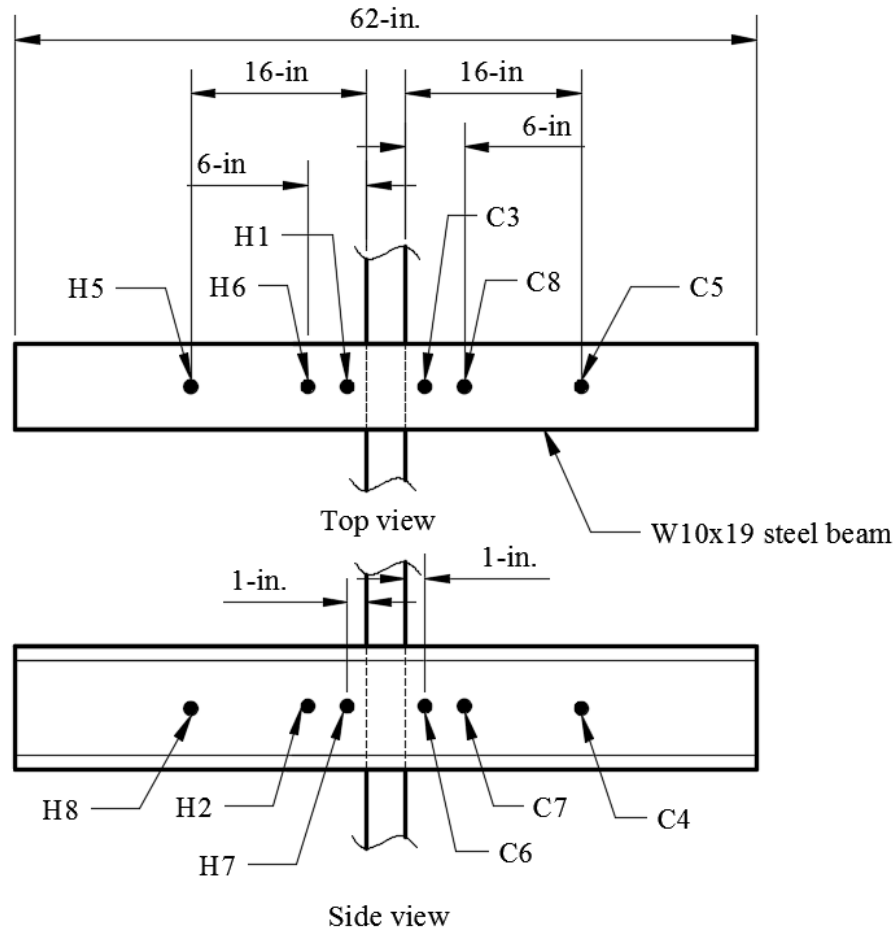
Sensor arrangement for the continuous beam thermal bridge
